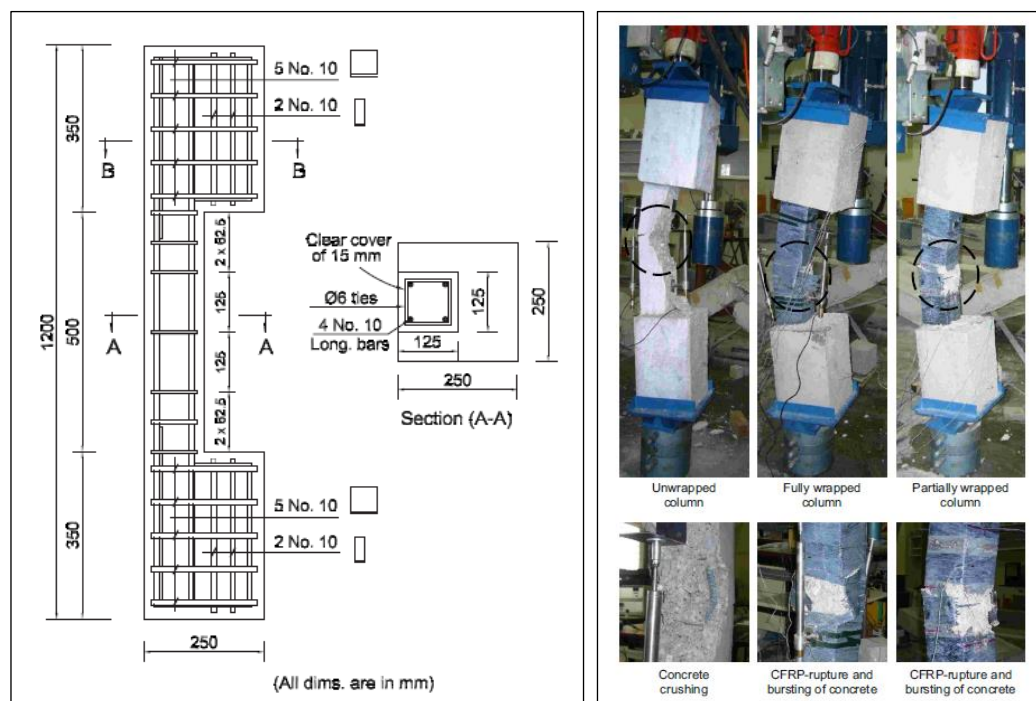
Eccentrically loaded columns with corbel ends, from left; specimen details and failure modes, El Maaddawy (2009)
